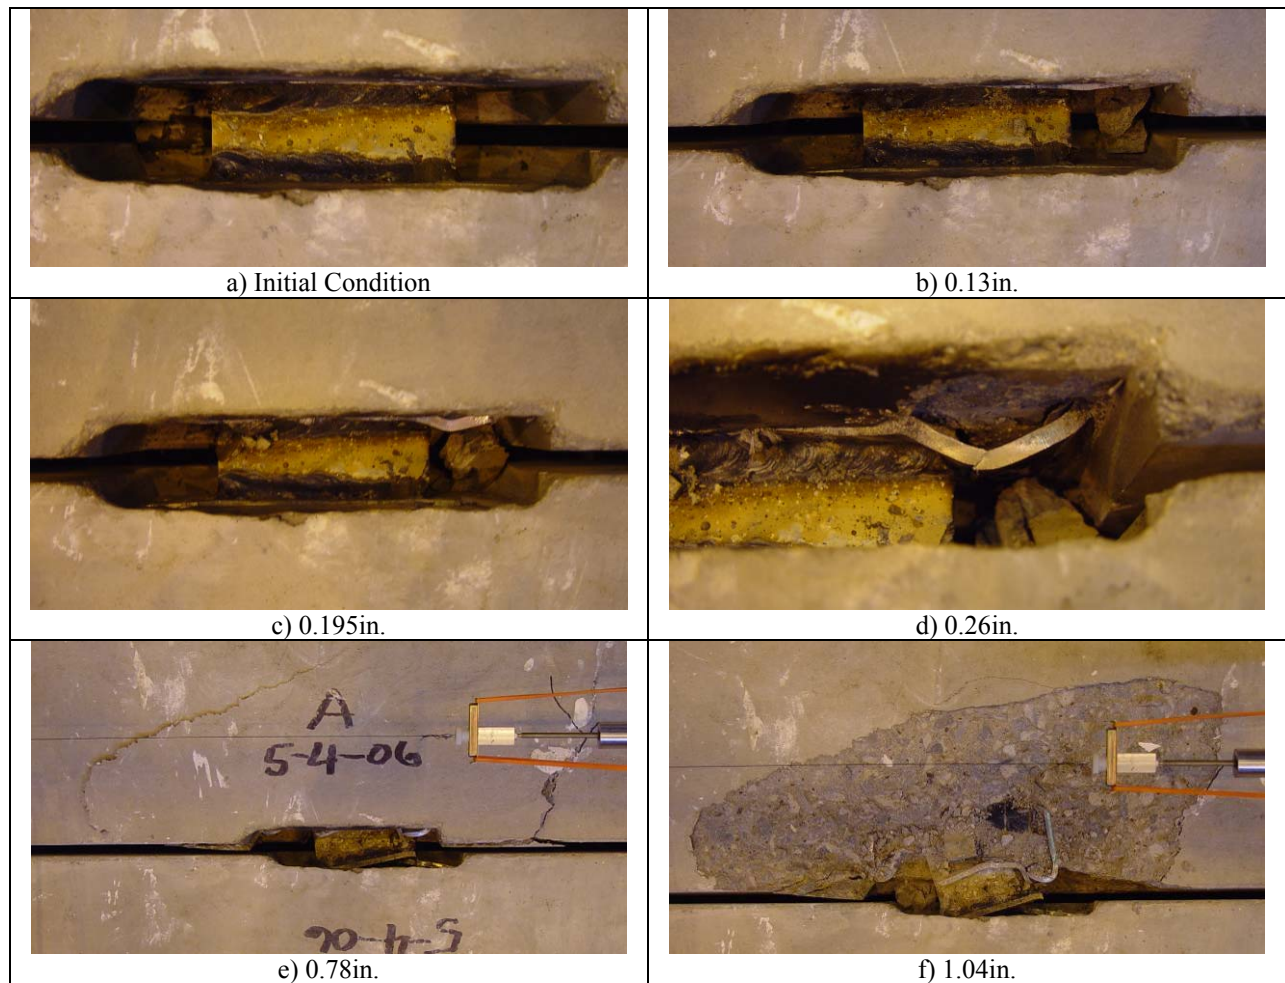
Axial force and shear displacement cyclic shear with 1 weld
